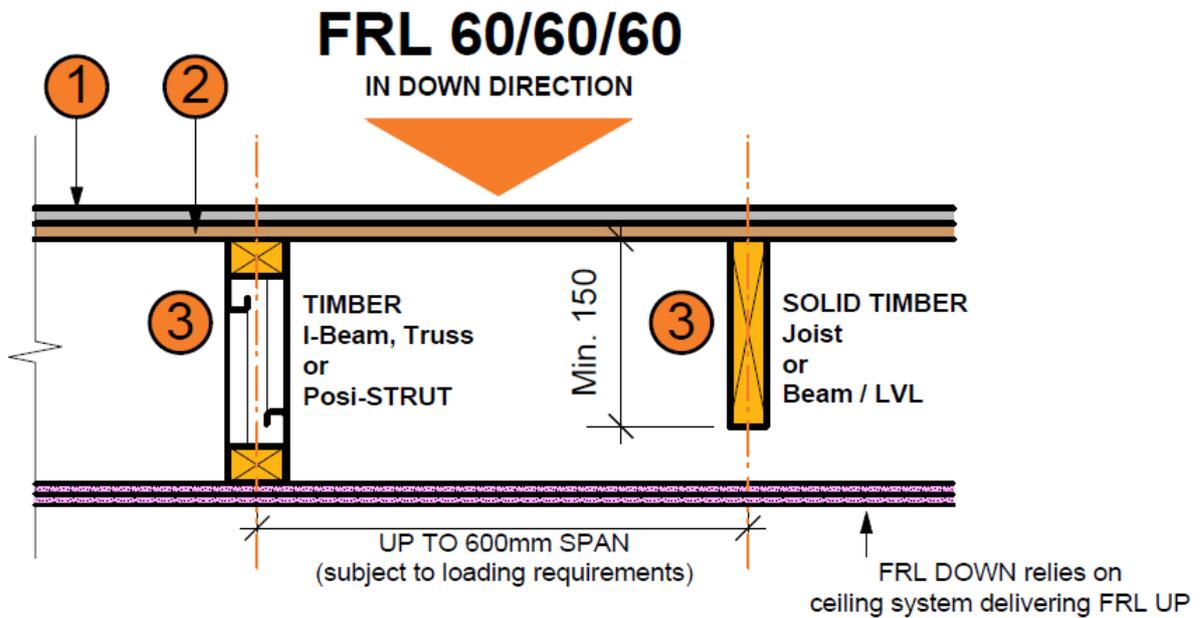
Timber frame floor/ceiling system with 1 × 19 mm INEX>FLOOR19 on top of plywood or particleboard Flooring
